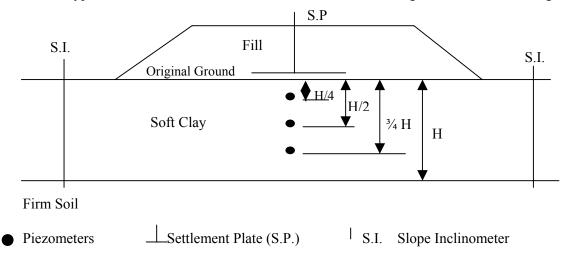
Typical instrumentation location for an embankment over soft ground
